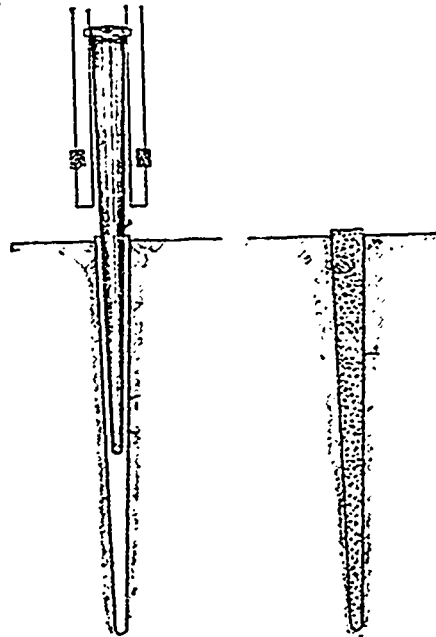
SHOWING PILE CORE COLLAPSED AND PARTLY WITHDRAWN FROM THE SHELL. ALSO COMPLETE CONCRETE PILE WITHOUT REINFORCEMENT.
